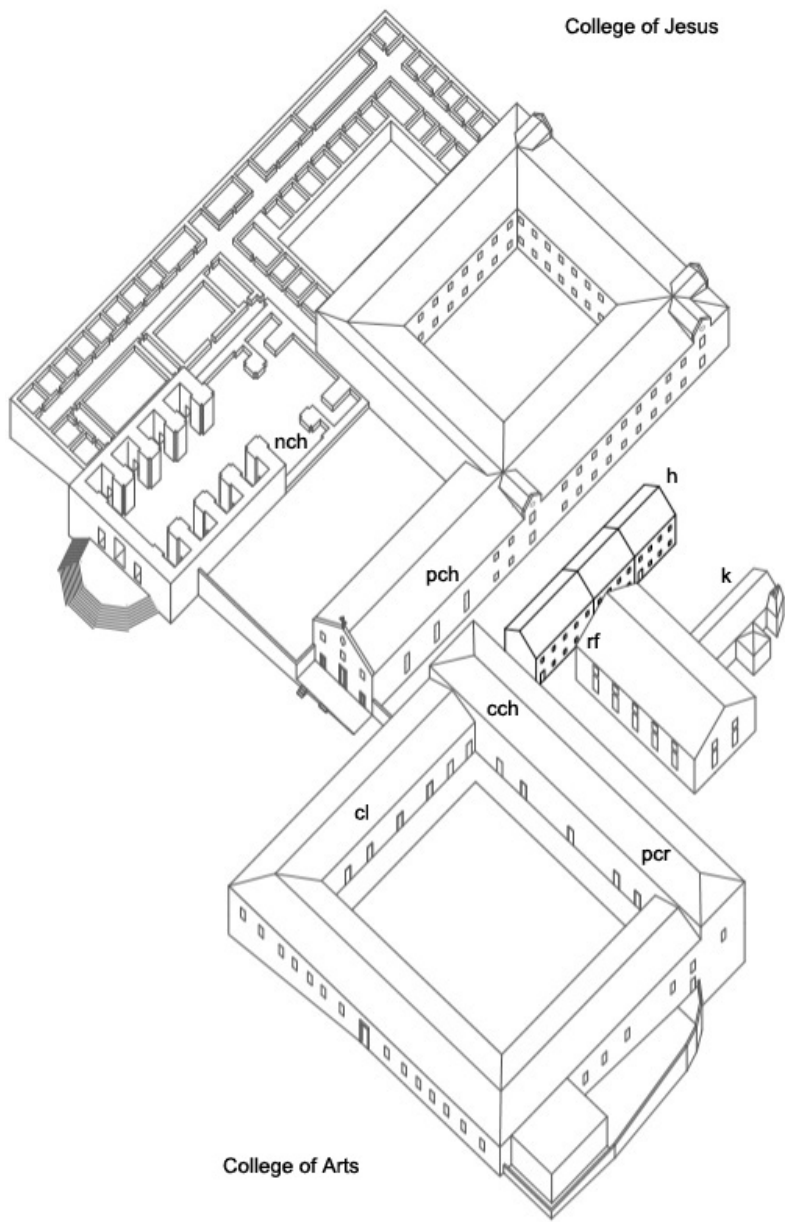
The Jesuit Colleges of Coimbra in 1617 (author's drawing): College of Jesus – pch: provisional church, nch: new church (in construction); h: S. Sebastião Street houses; rf: refectory; k: kitchen; College of Arts – cch: college chapel, pcr: public ceremonies room; cl: classrooms;
